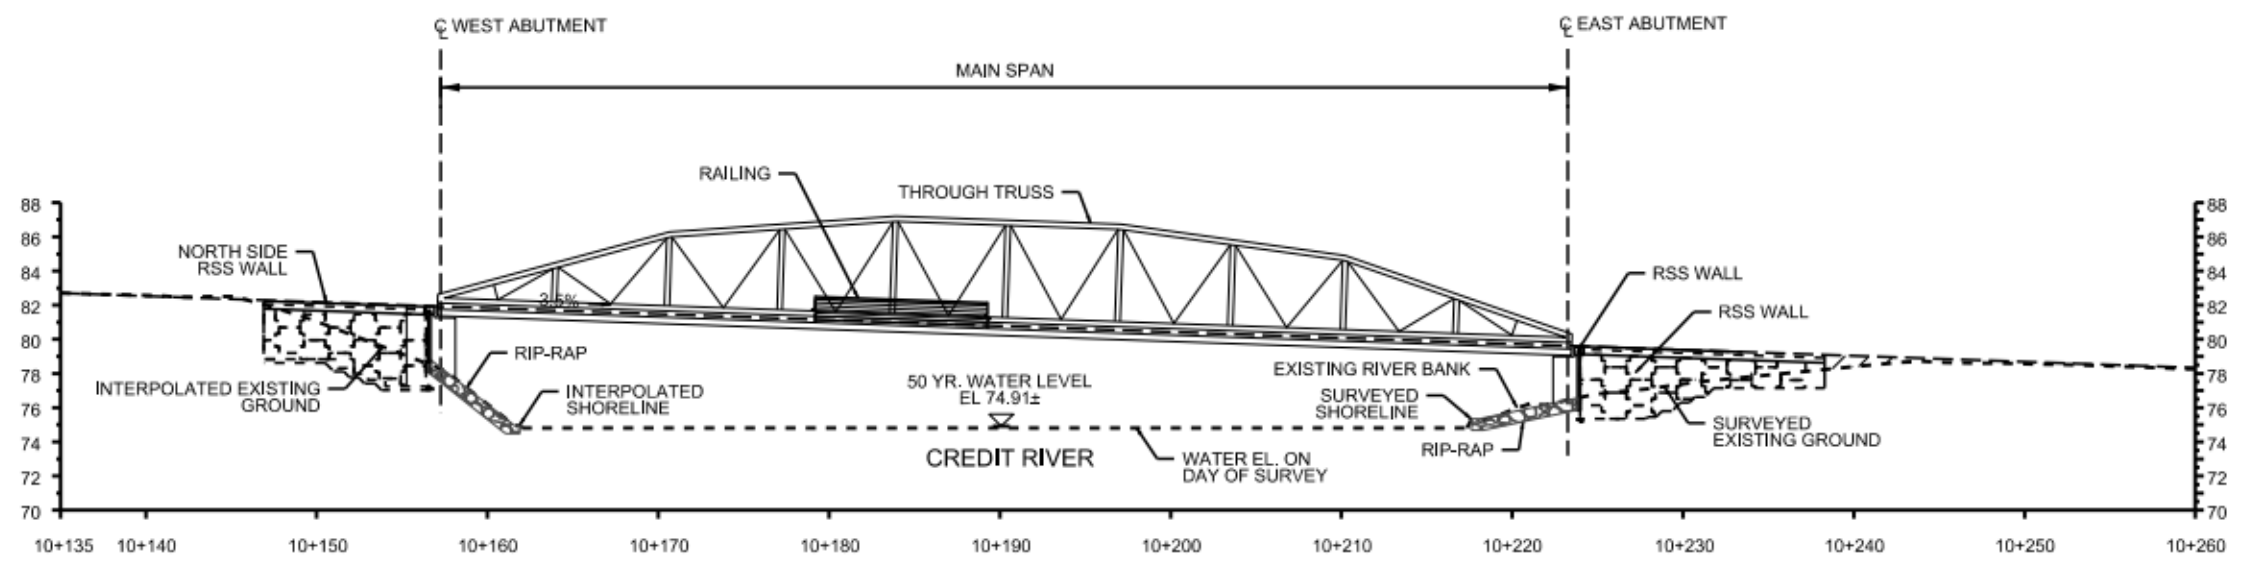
Plan and Profile of the Through-Truss Bridge
